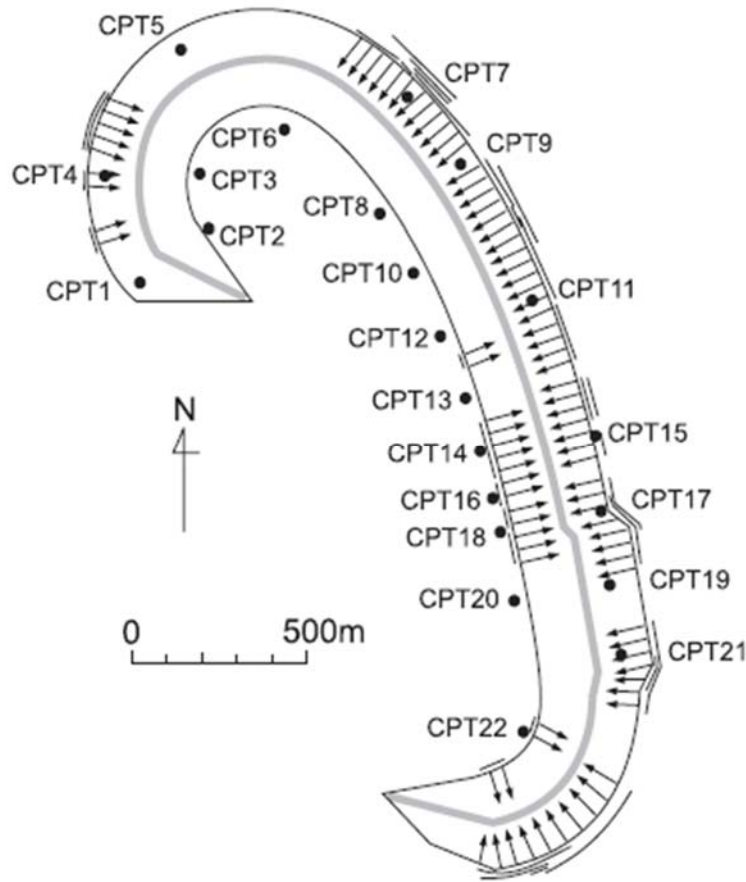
Plan view of the West Guide Bind of the Jamuna Bridge, with arrows showing locations of failures and points noting locations of CPT's (from Yoshimine et al., 2001).
